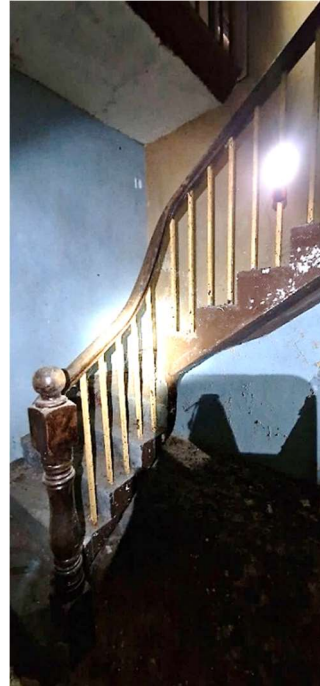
Stairs in north wing with bottom steps replaced with concrete
